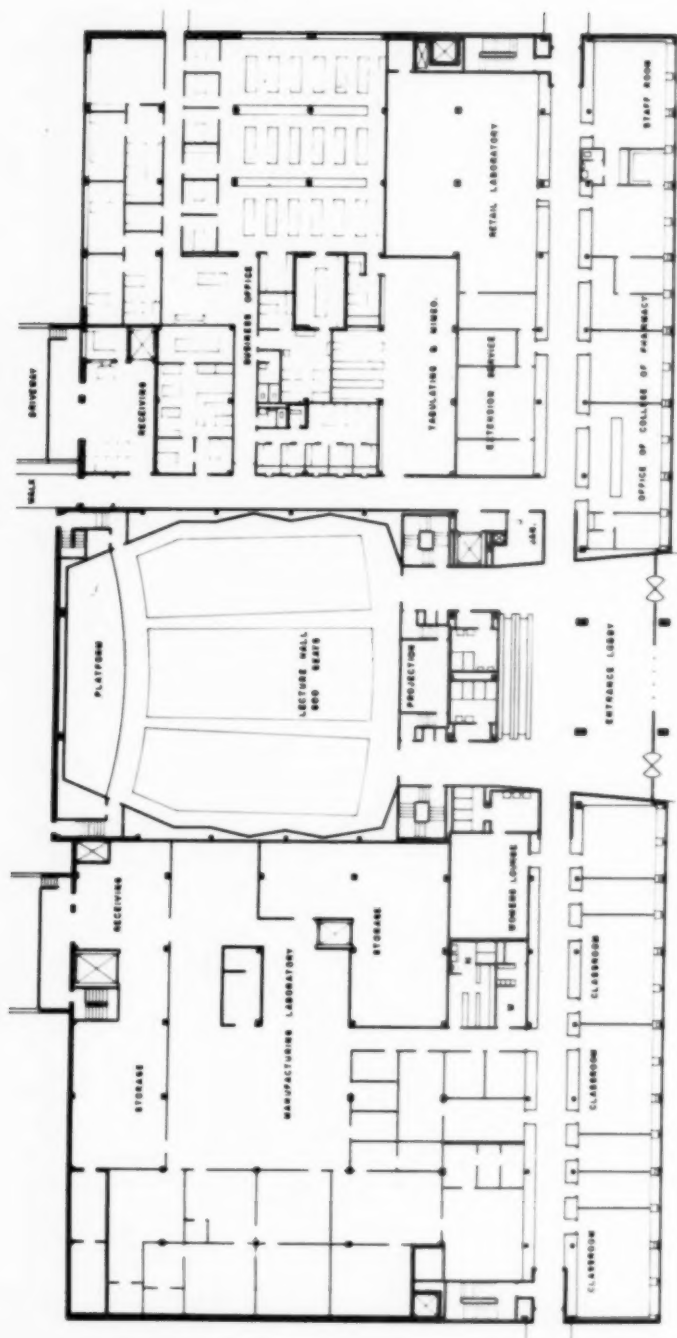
FIRST FLOOR PLAN, UNIVERSITY OF ILLINOIS
